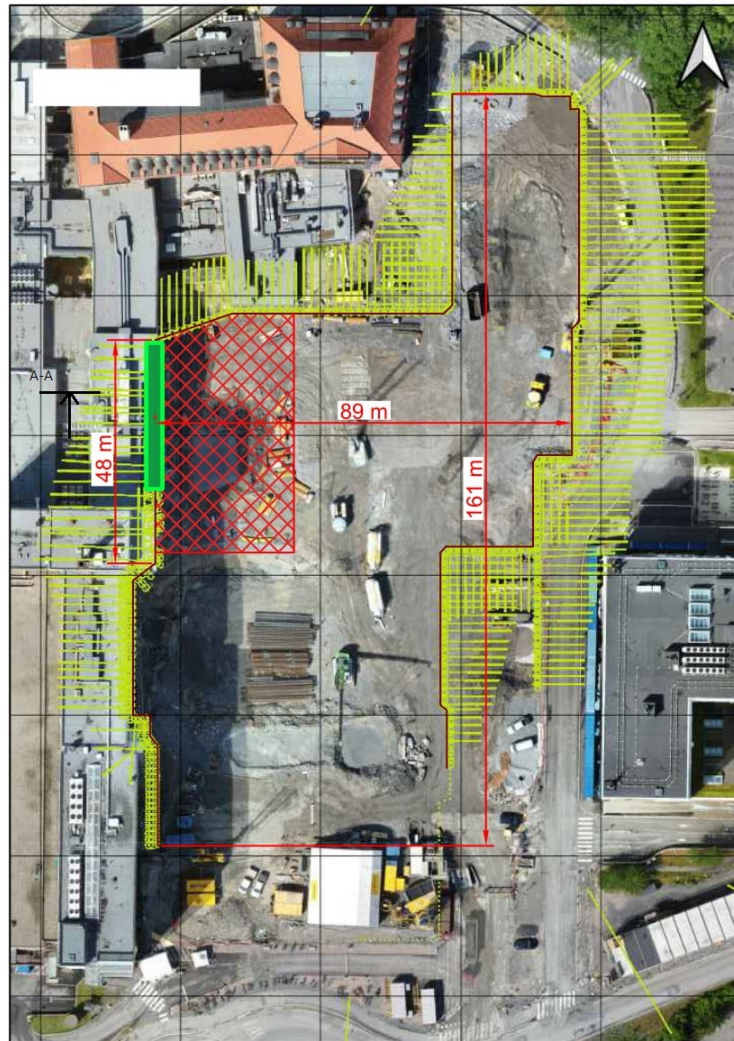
Overview of the excavation site. Secant jet grouting wall studied is within the green rectangle. The red hatched area represent the demolished section of the building and the yellow lines are the anchors (after Keller, 2021)
